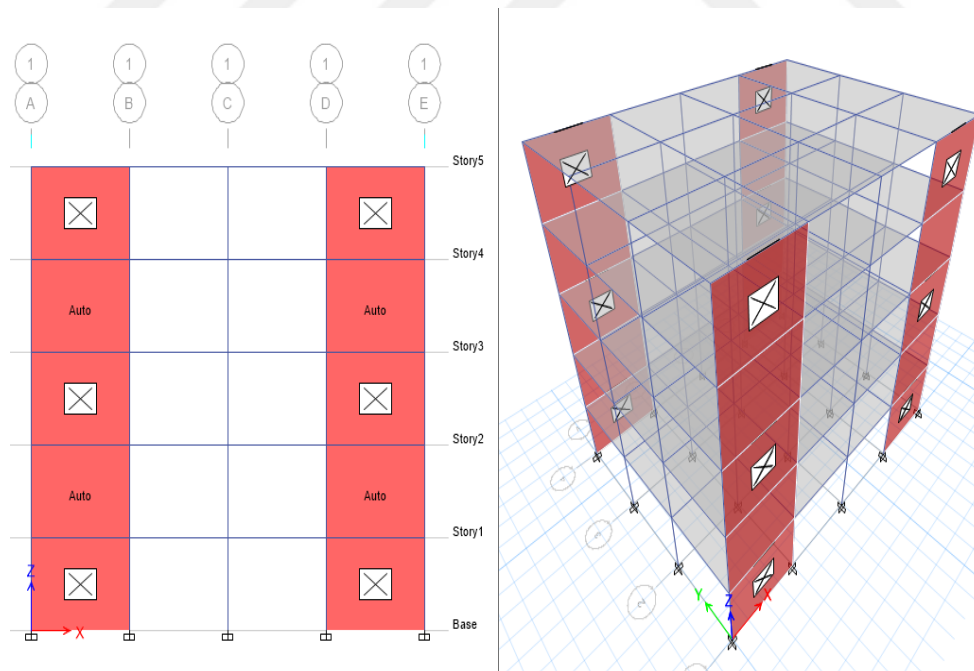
The 5-story building with concrete shear walls and with openings in odd stories.
